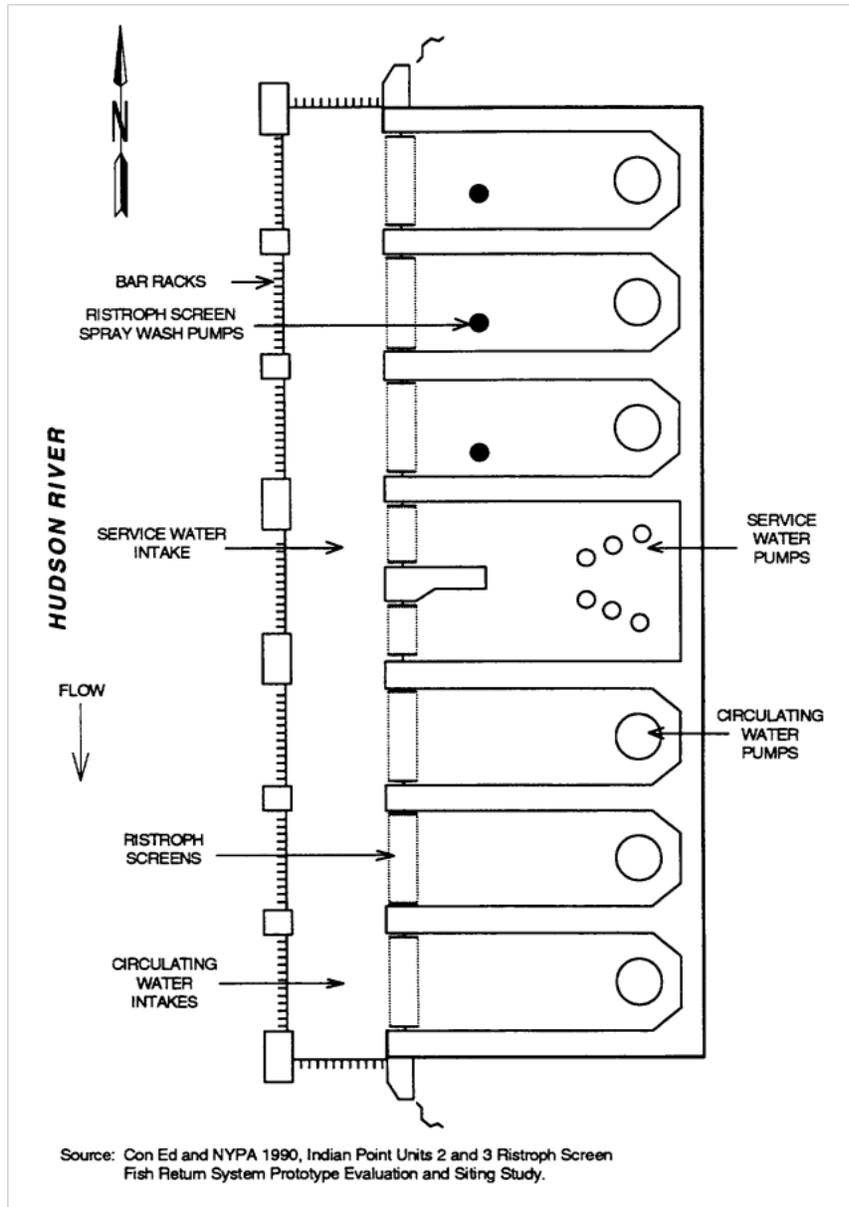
Indian Point Unit 3 (IP3) cooling water intake structure – plan view.
